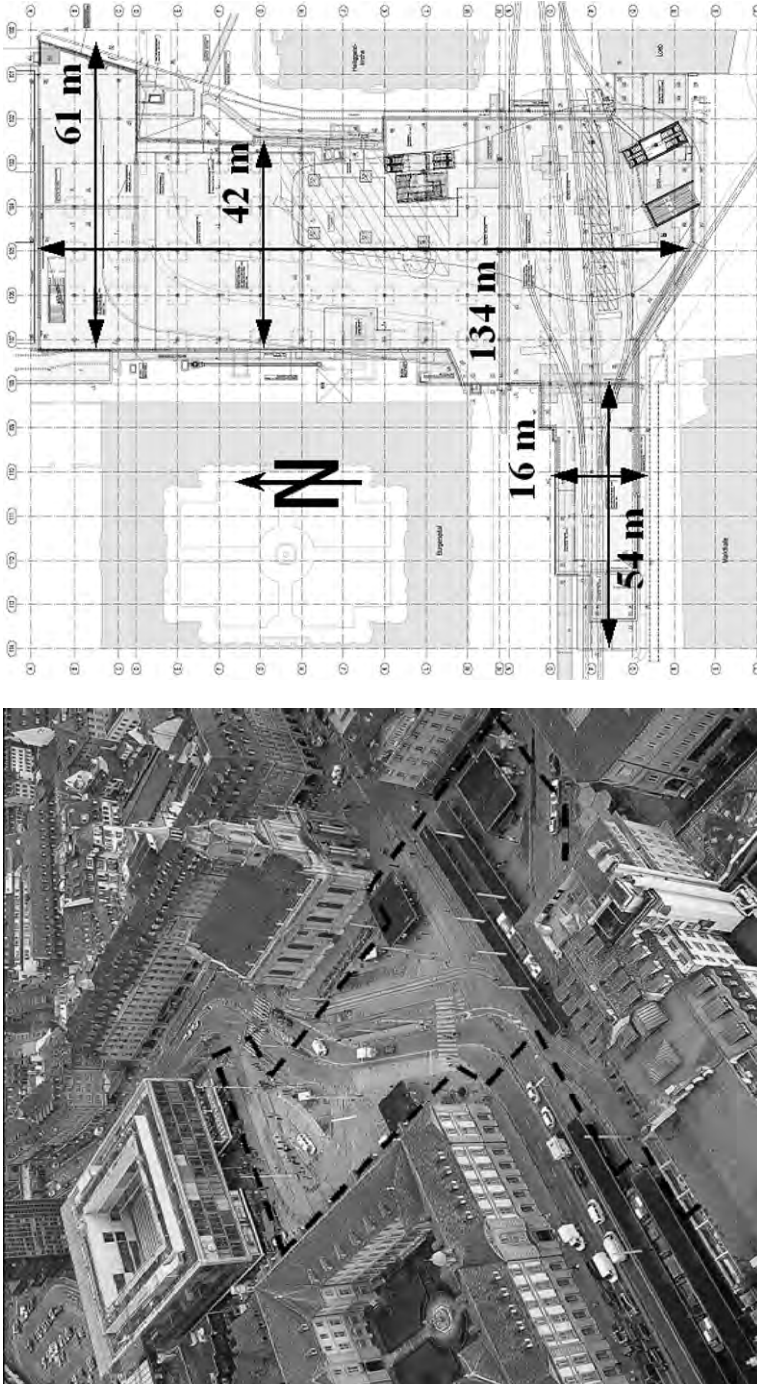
View of the Station Square Bern before refurbishment and dimensions of the underground passage
